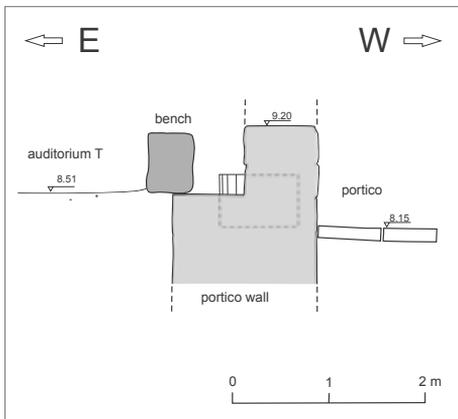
Auditorium T: cross-section through the benches and portico backwall (PCMA UW Alexandria Kom el-Dikka Project | drawing G. Majcherek)
